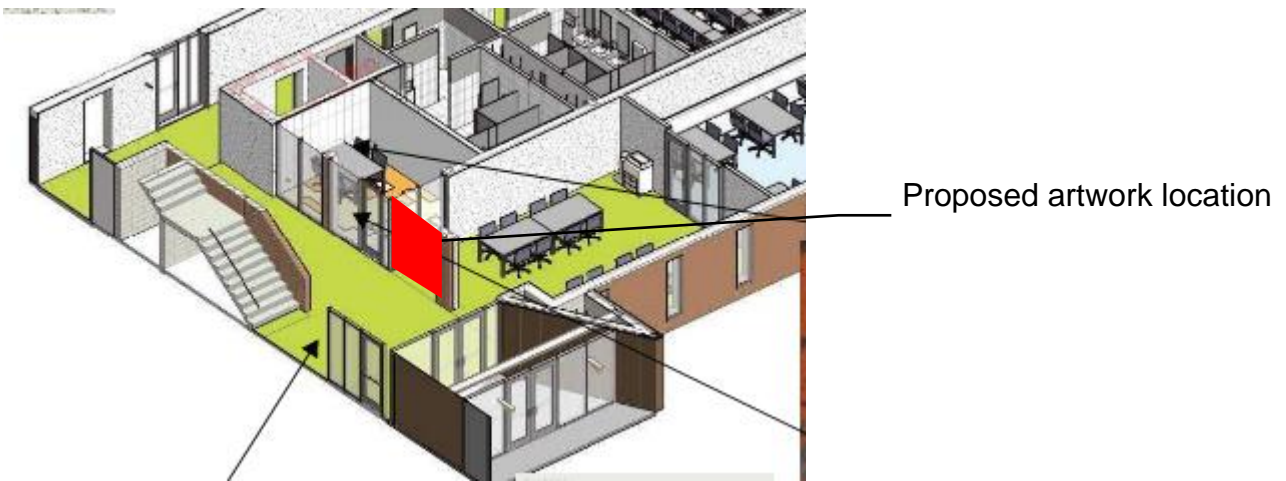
Architectural rendering of entrance area with proposed location of new artwork highlighted
